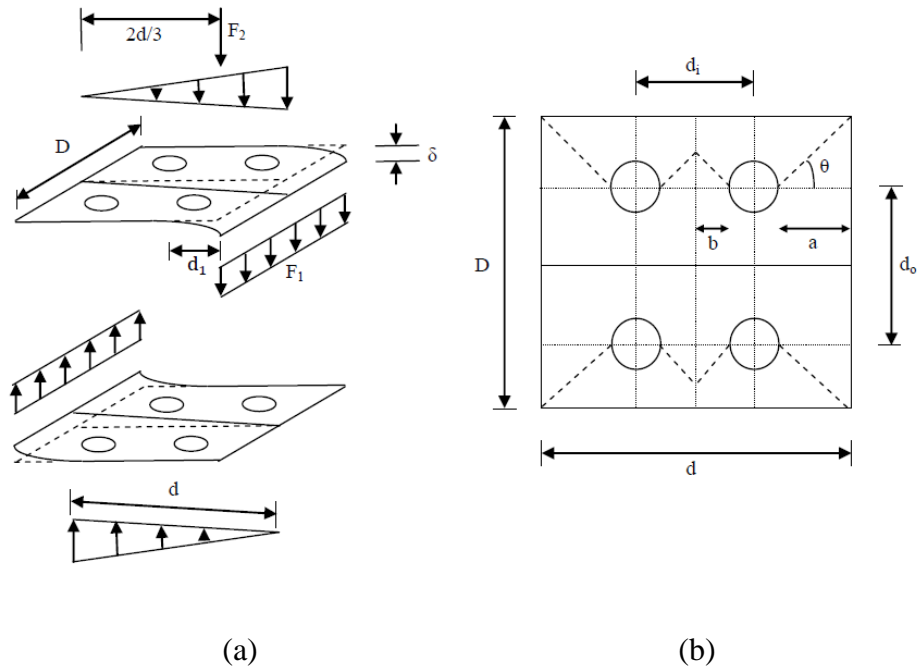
(a) Deformation of the bolted flanges. (b) Dimensions of the bolted flanges [26].
